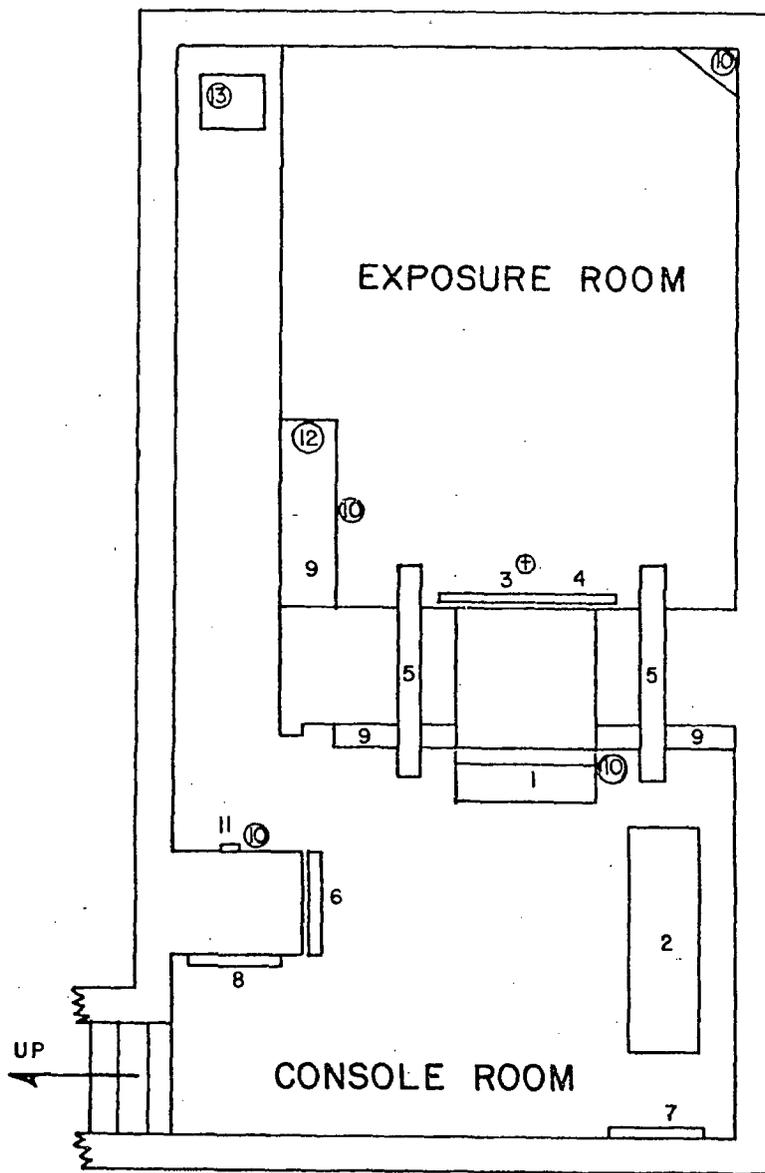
ELEVATION VIEW UNDERGROUND VAULT
